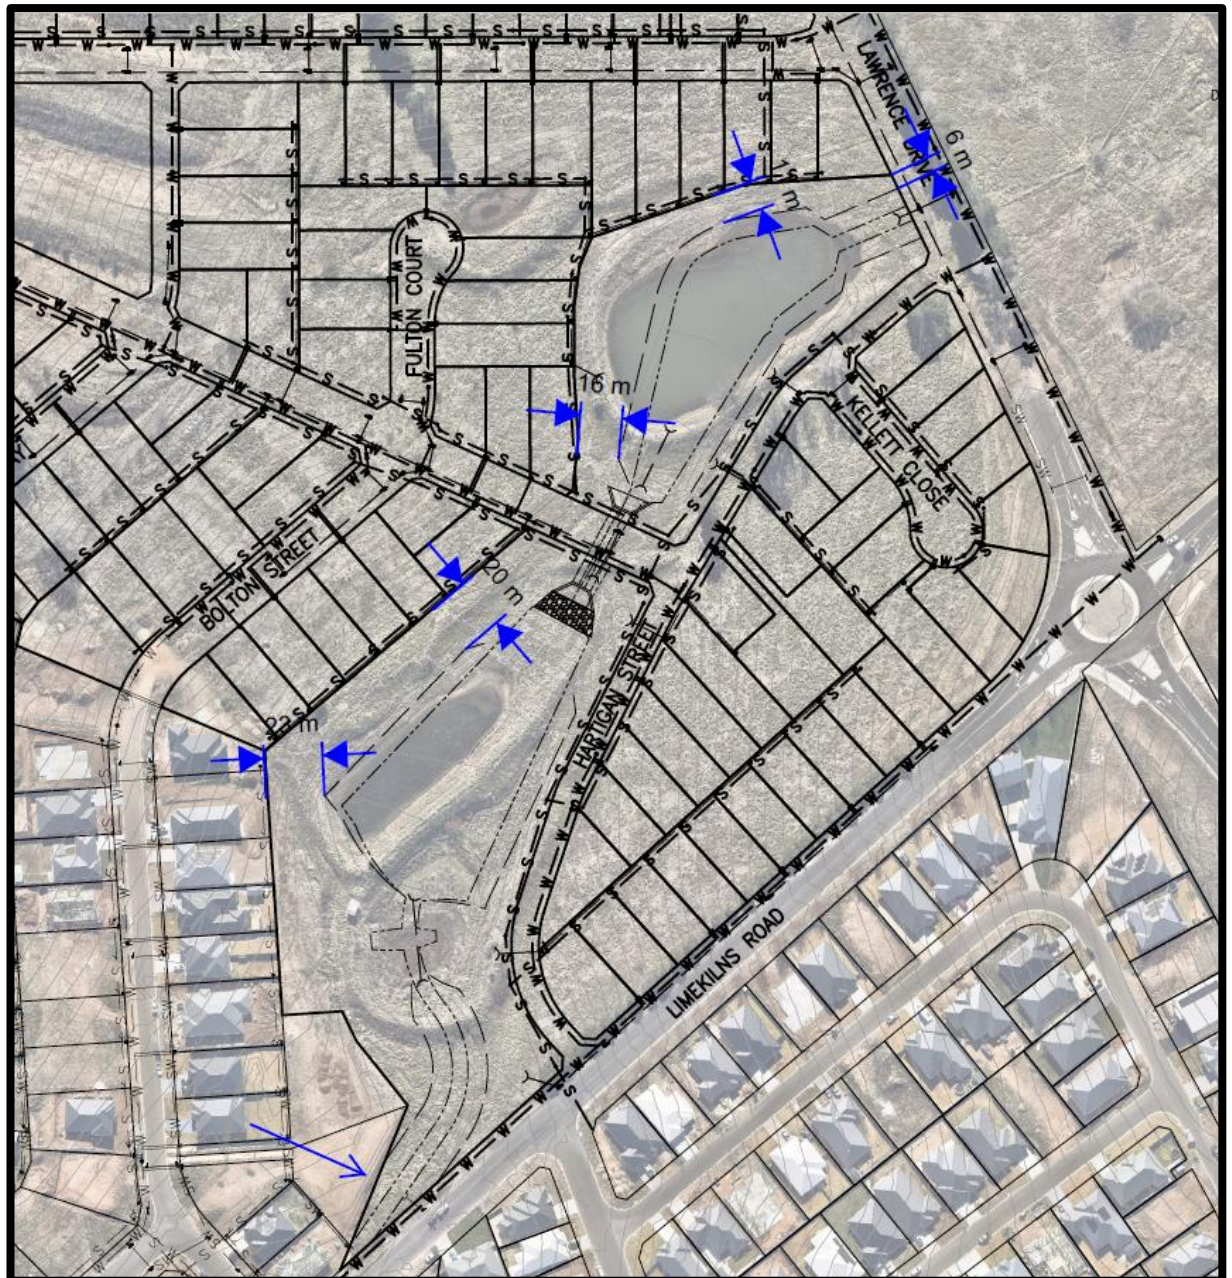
Service Layout Plan for Proposed Subdivision – Estimated Distance of 0 to 11 metres Between Water Detention and Residential Lot Boundaries – Lot 157 DP 1275358
